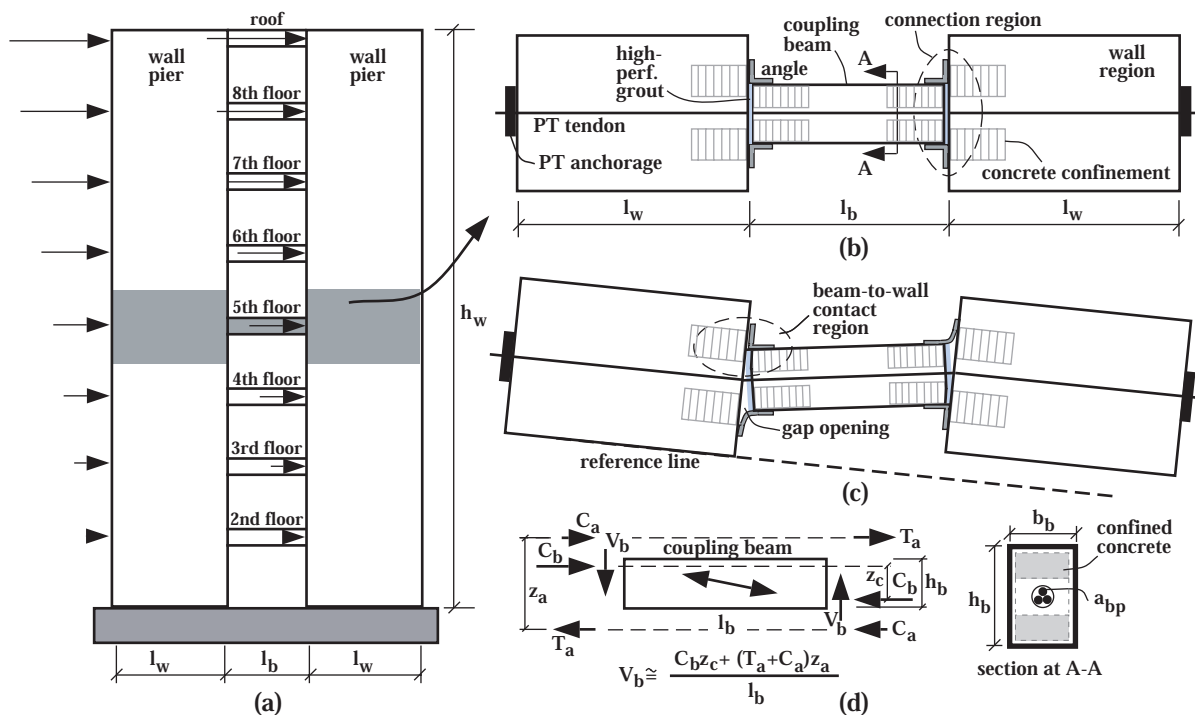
Coupled wall system: (a) multi-story structure; (b) floor-level subassembly; (c) idealized exaggerated displaced shape; and (d) coupling forces.
